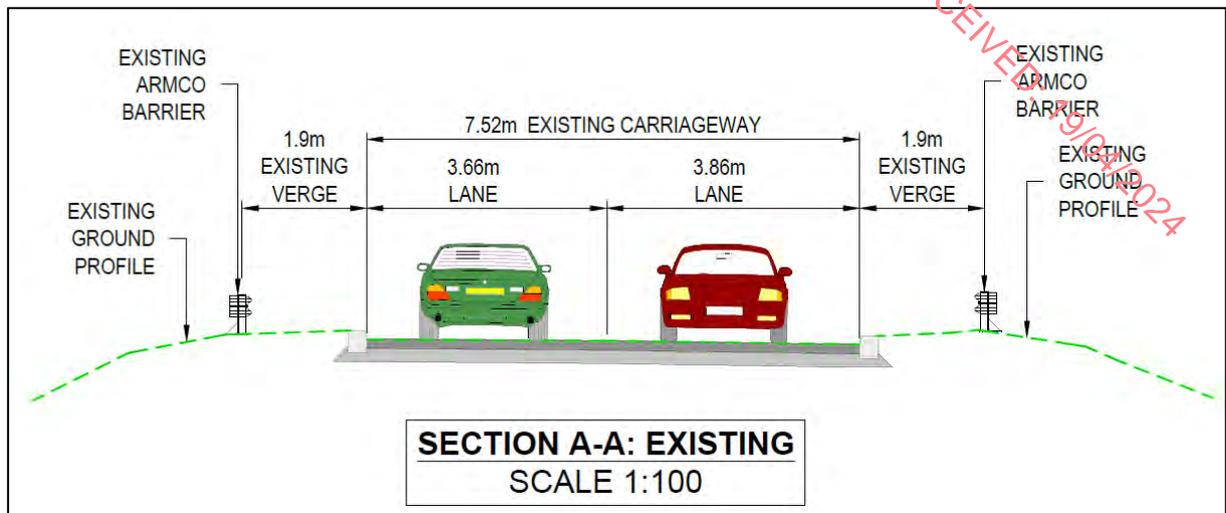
Bhailsigh Road (L1140) section near roundabout
